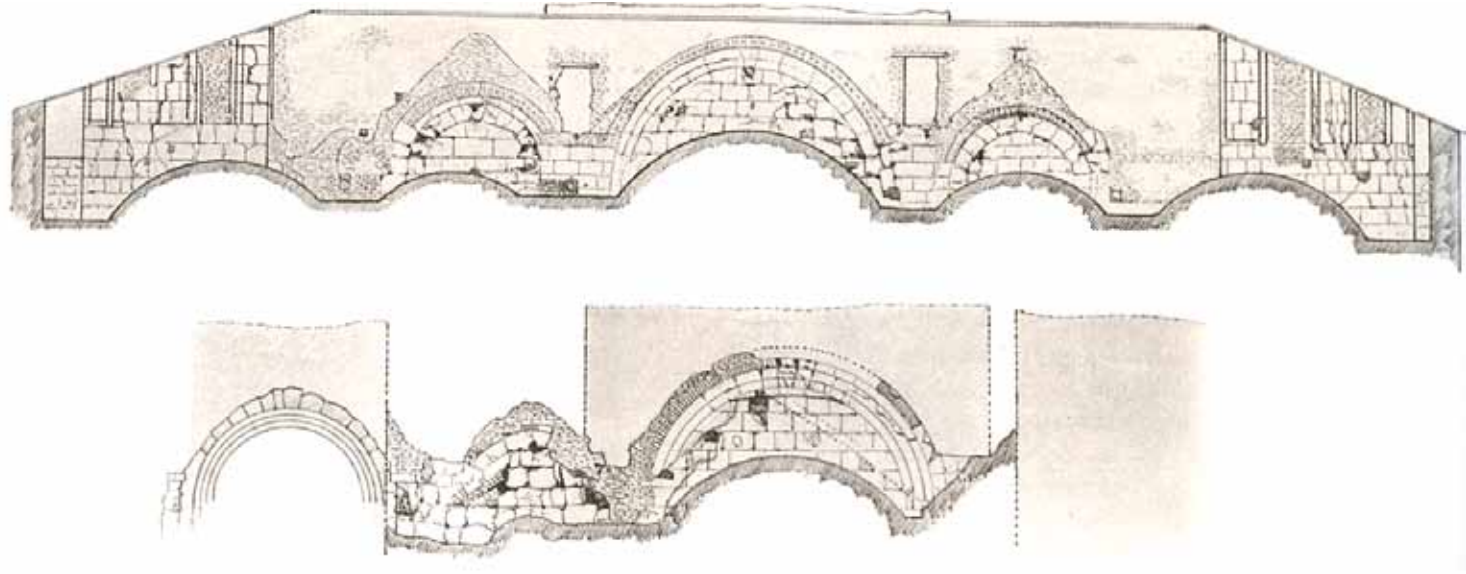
Vladimir. Cathedral of the Dormition, the 12th century. Wall tops' masonry fixation. Measured in 1885.
